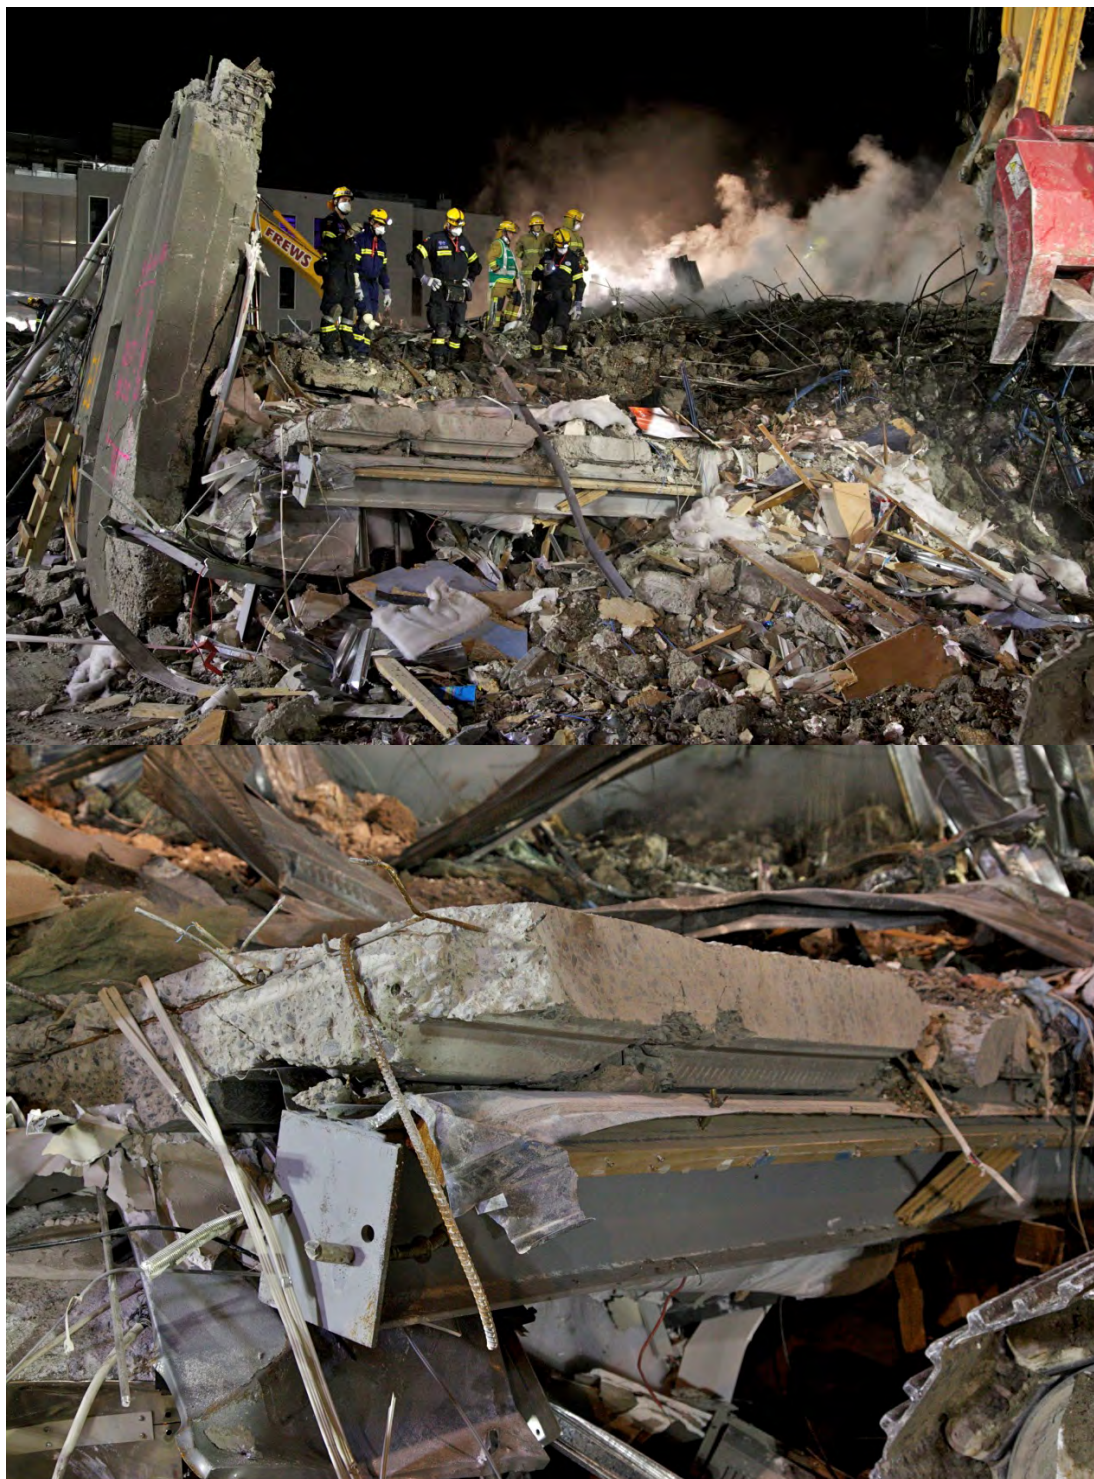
Steel trimming beam: Level 2, south-east corner of the Building
